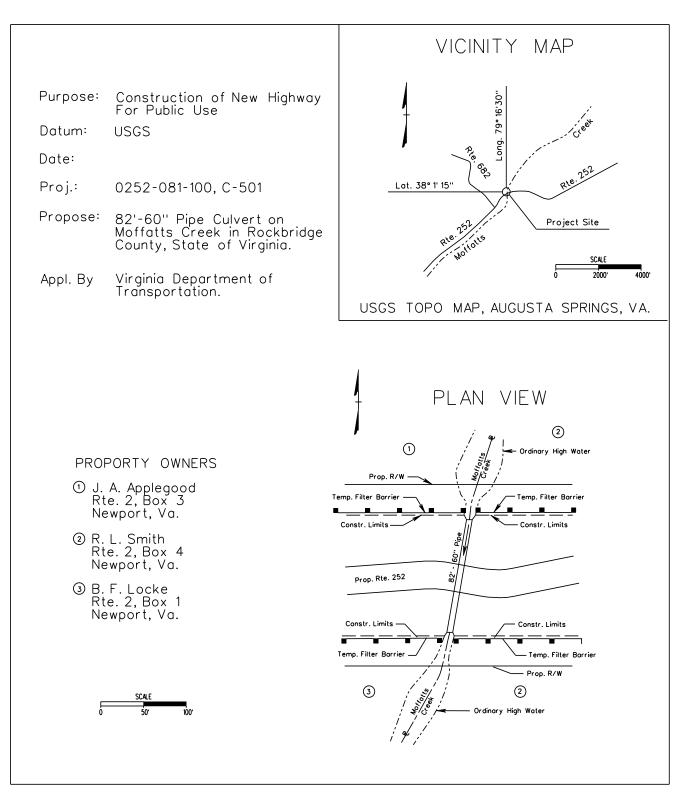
CULVERT (NON-TIDAL) PLAN VIEW
